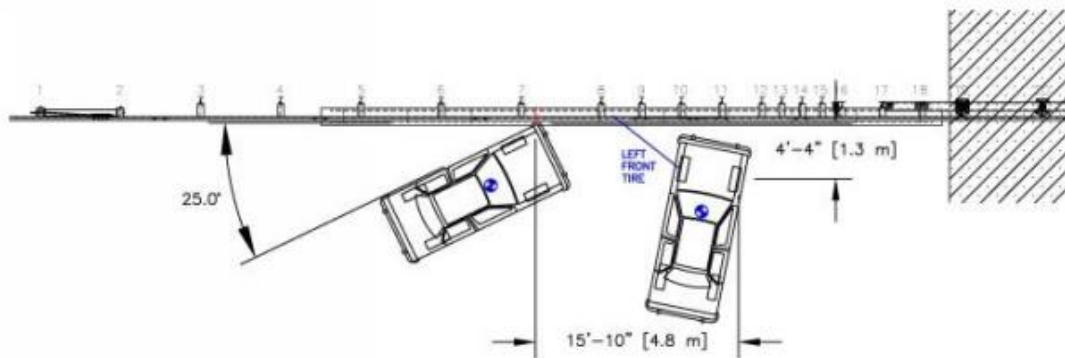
Test Impact Drawings for Test No. MWTC-1.
